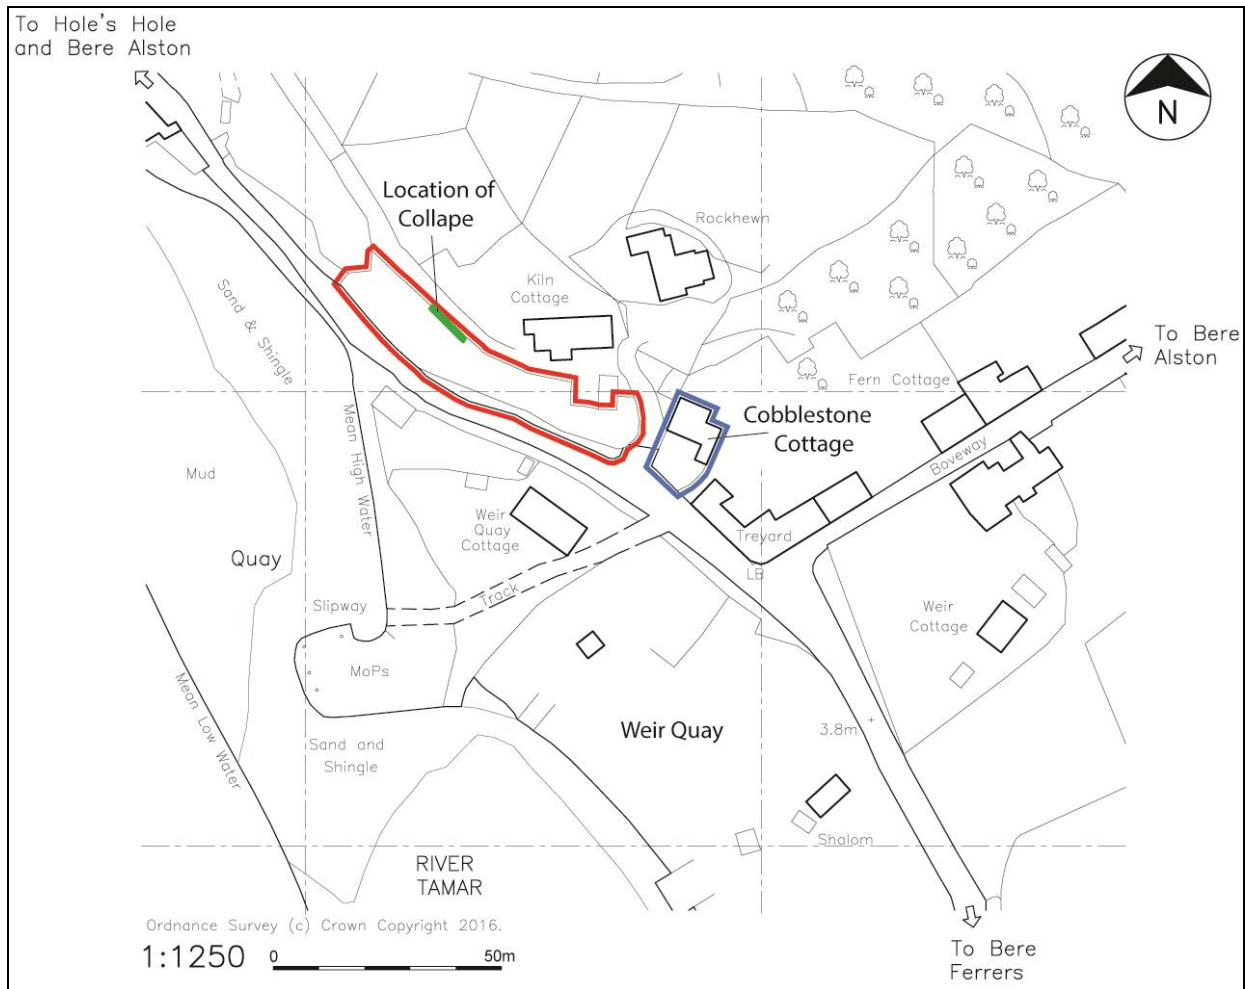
Site location and plan showing the location of the site bounded in red, and area of works in Green.
